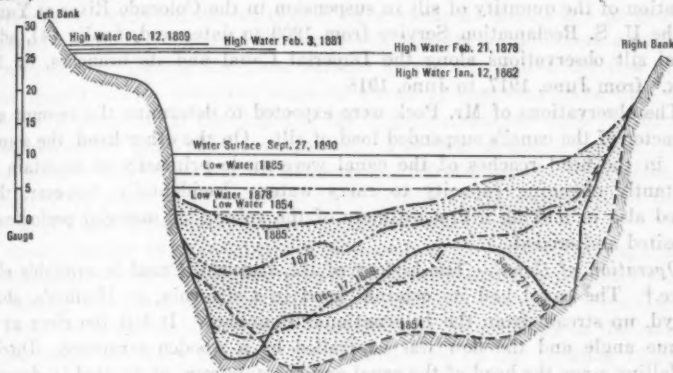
CROSS-SECTION OF THE SACRAMENTO RIVER, AT THE FOOT OF K STREET, SACRAMENTO, CALIF.
